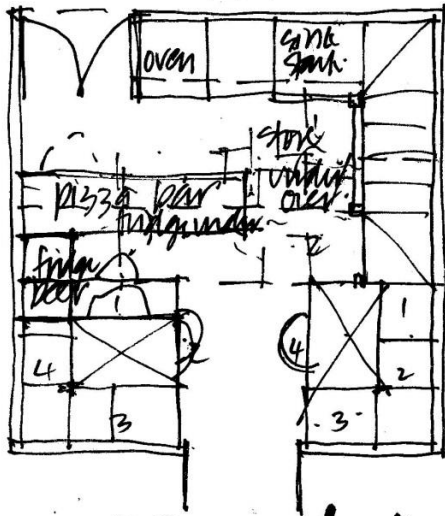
‘Waiting room’ – 2.4m wide and about 6.6m long
